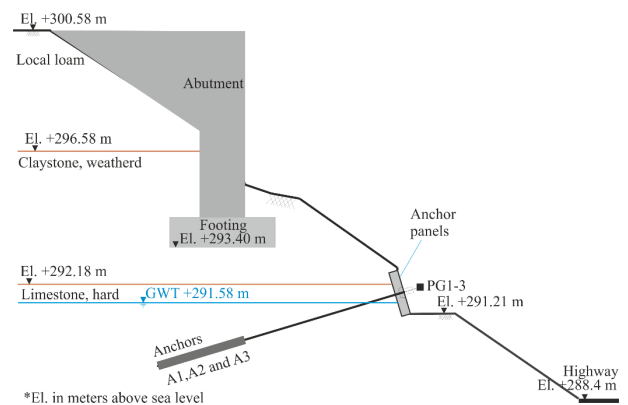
Side view of the embankment and abutment with the existing anchorage system.
